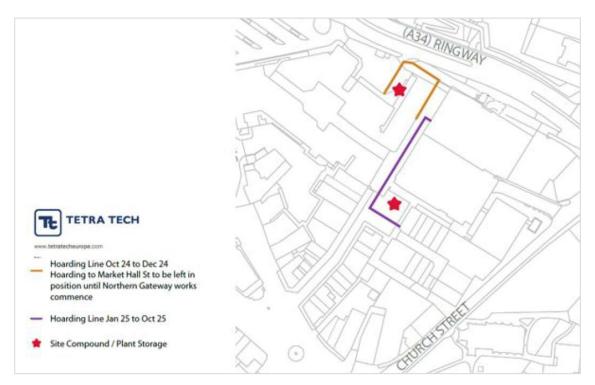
Extract from Demolition Method Statement REV 6 showing proposed hoarding lines whilst works are carried out
